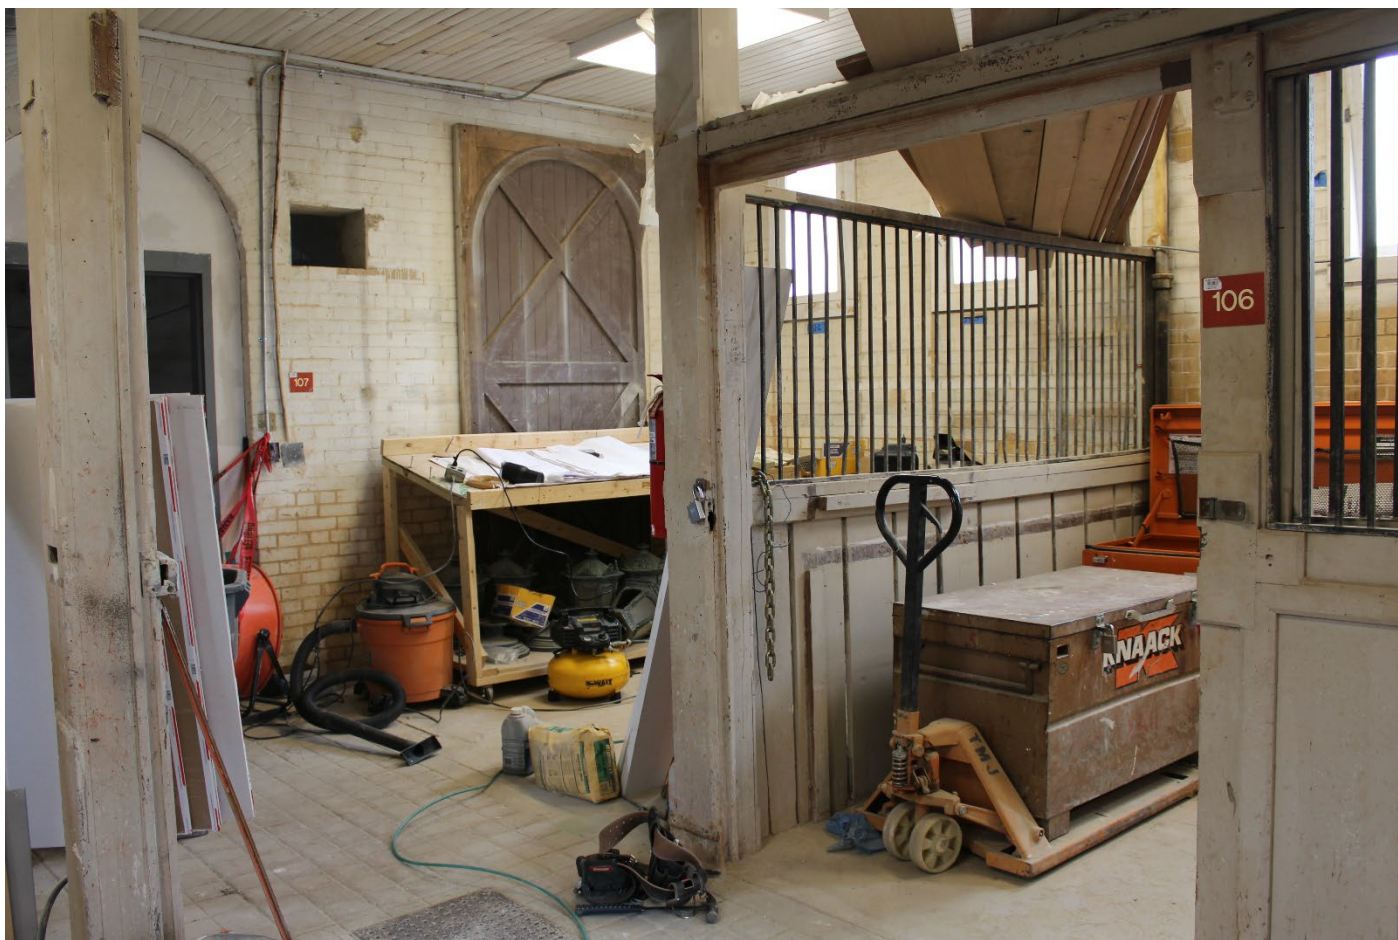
Carriage House – First floor interior space, camera facing southwest. June 11, 2025
